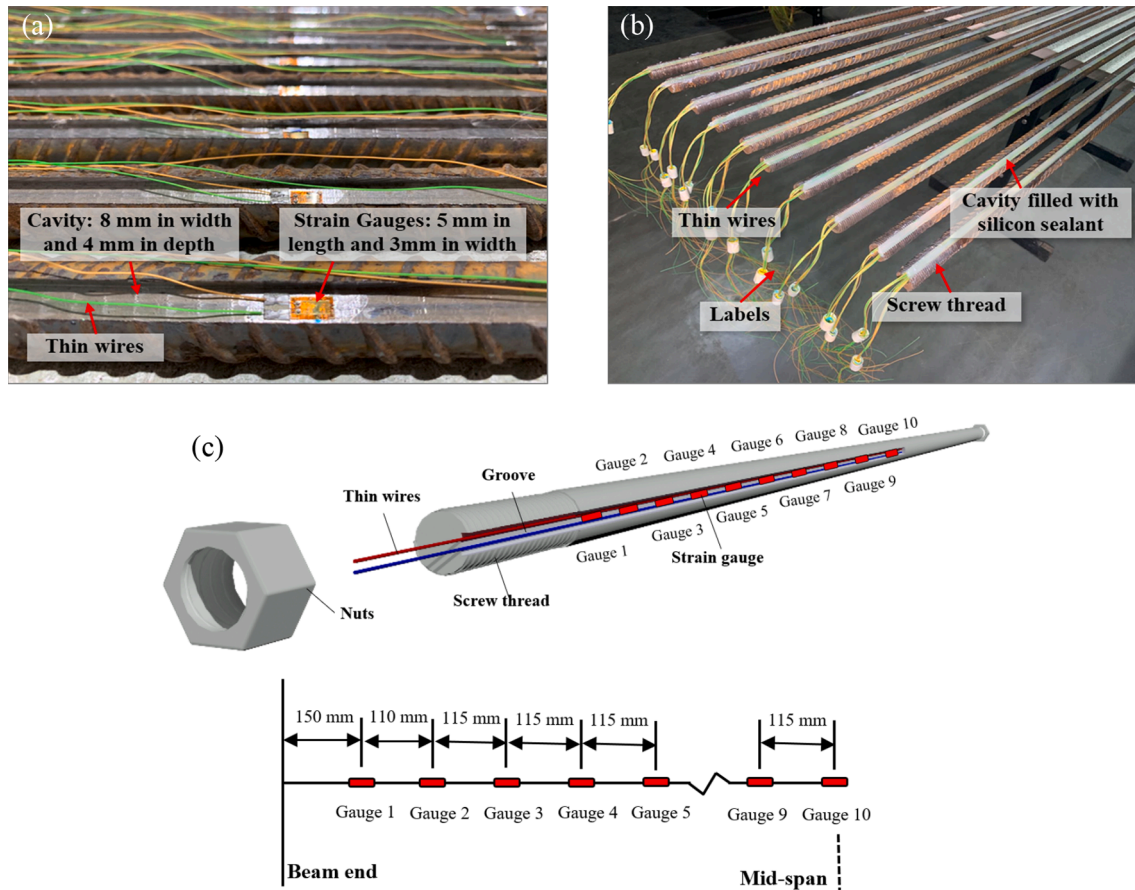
Strain gauging system for longitudinal reinforcement: (a) cavity on rebars; (b) full view of rebars; (c) layout of strain gauges.
